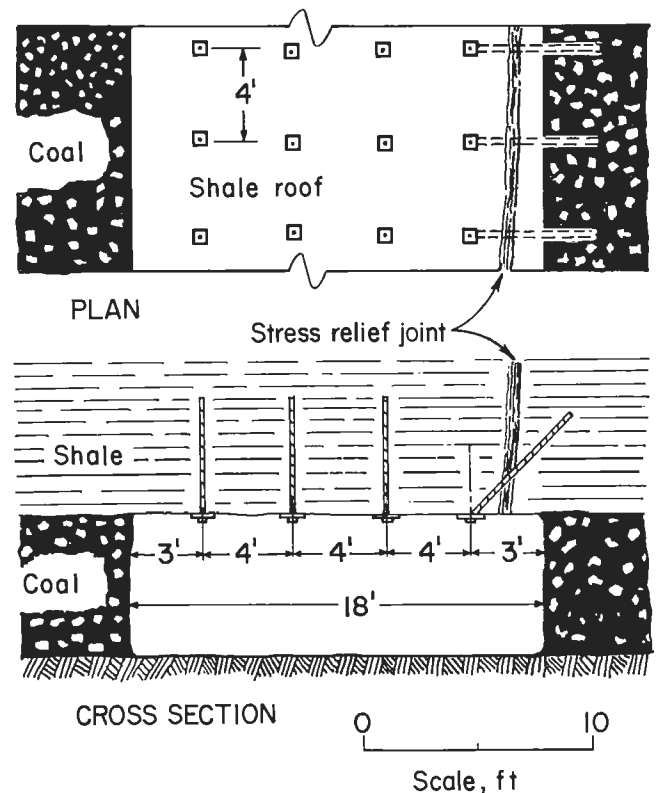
Roof bolts angled to intersect stress-relief joint and anchor over pillar.
